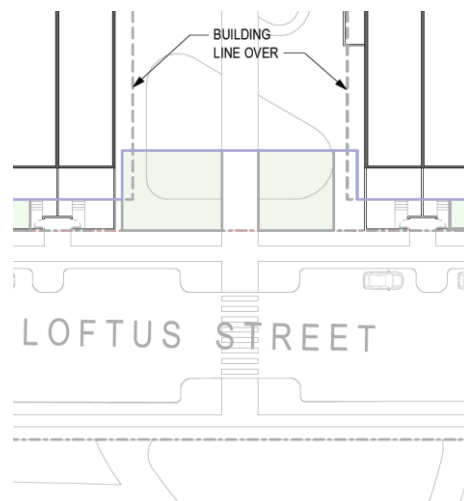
Proposed Loftus Street pedestrian crossing (Proposal Urban Design Report)
